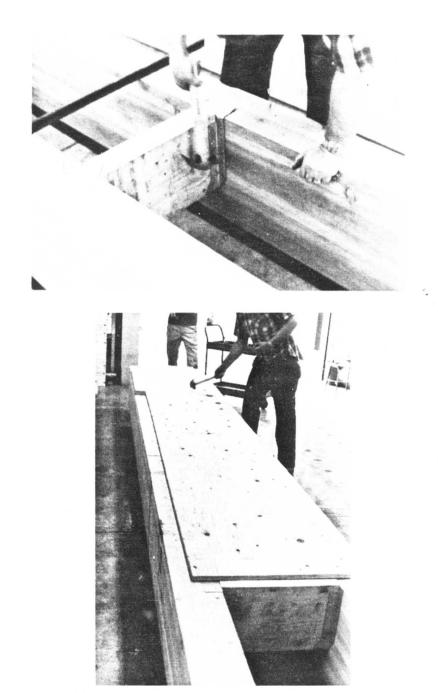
Photographs of 6-3/4" by 16-1/2" Glulam Beam Test Specimen Under Construction.
